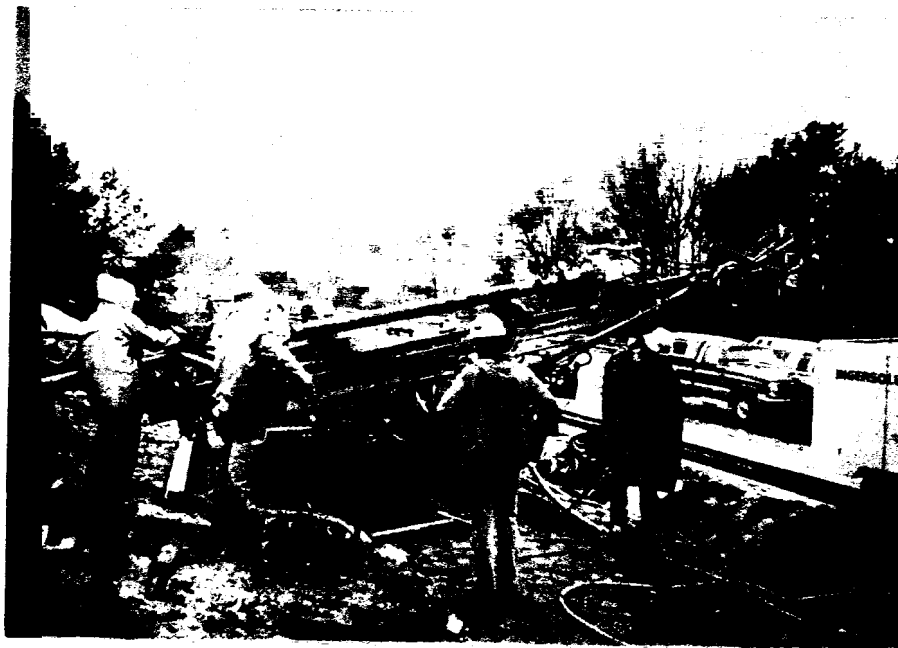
Removal of casing section and threading of instrument wires through casing
